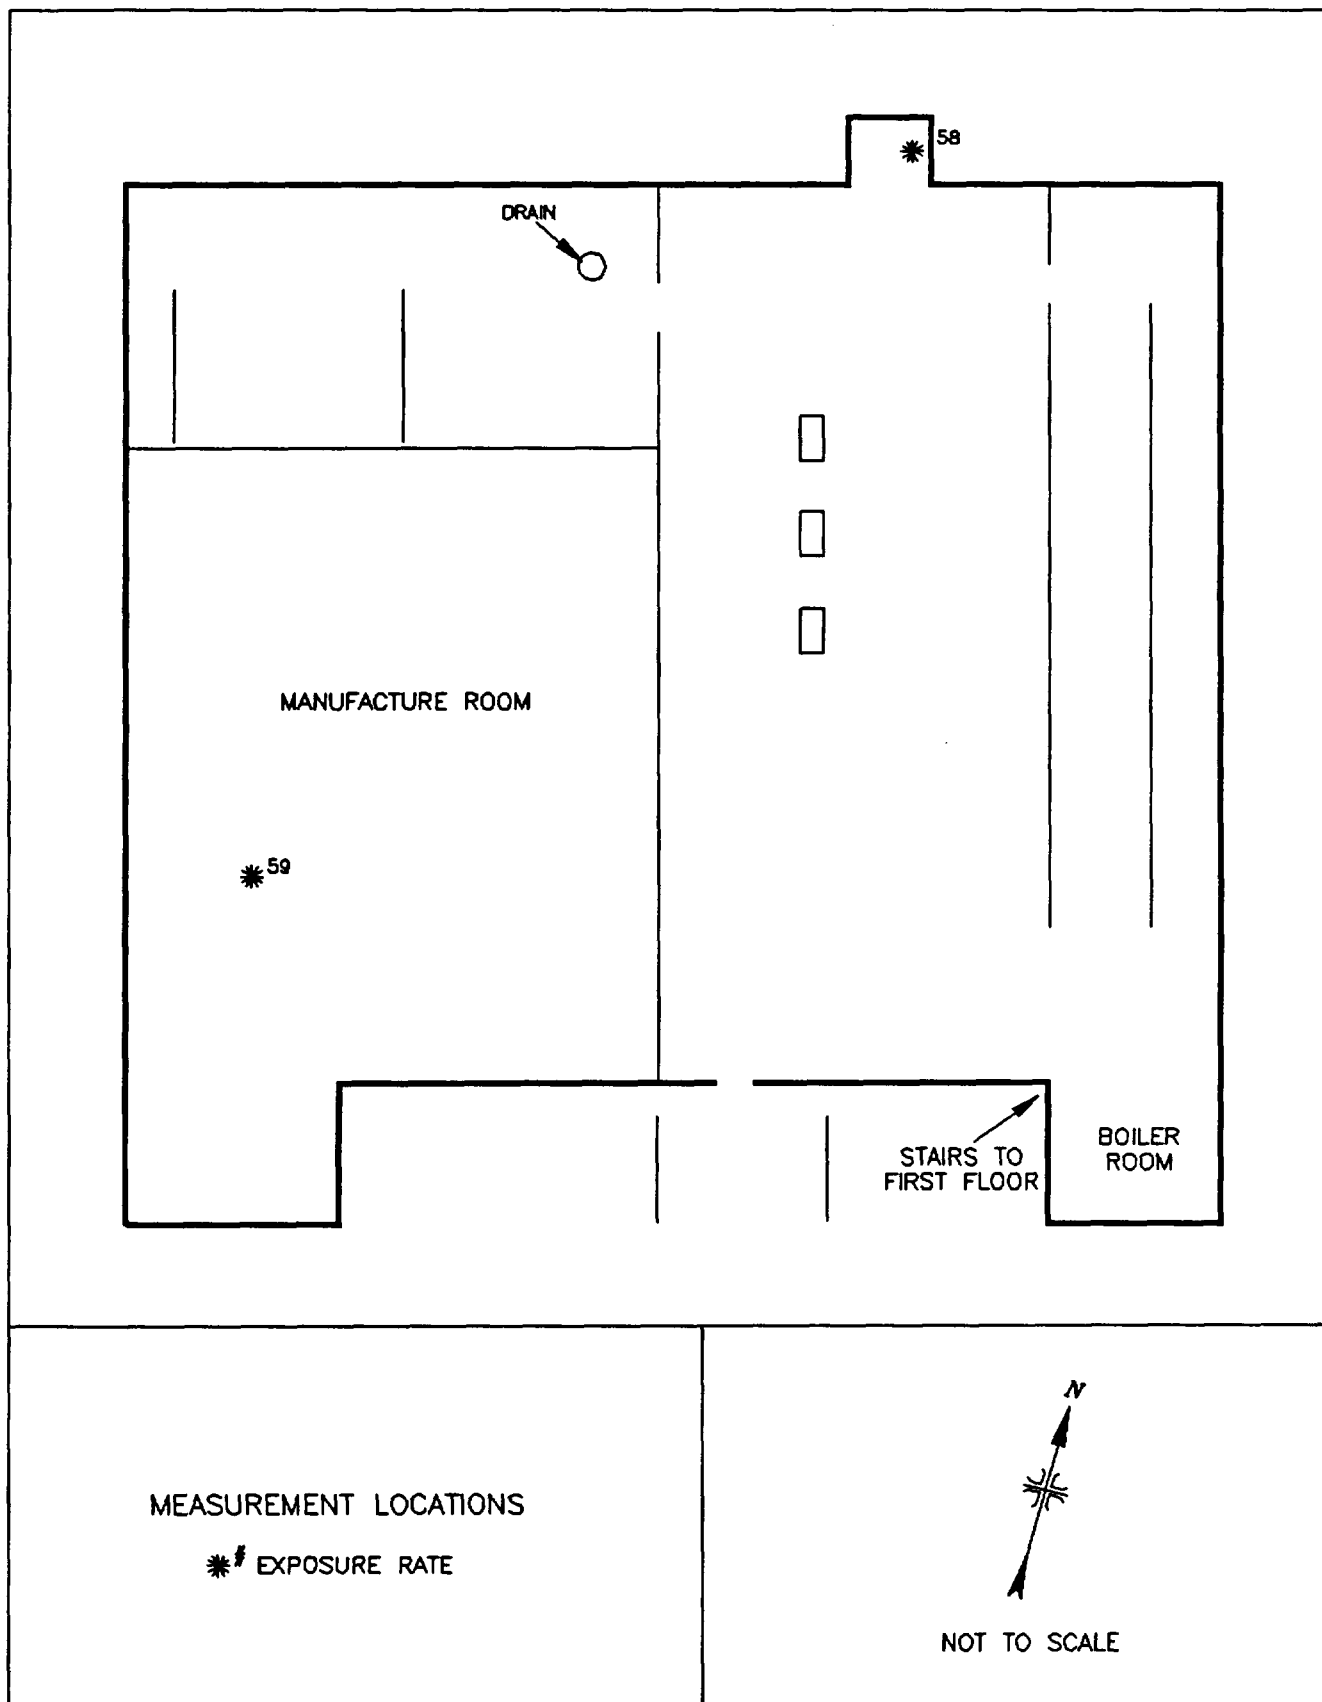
Building 8, Basement – Exposure Rate Measurement Locations
